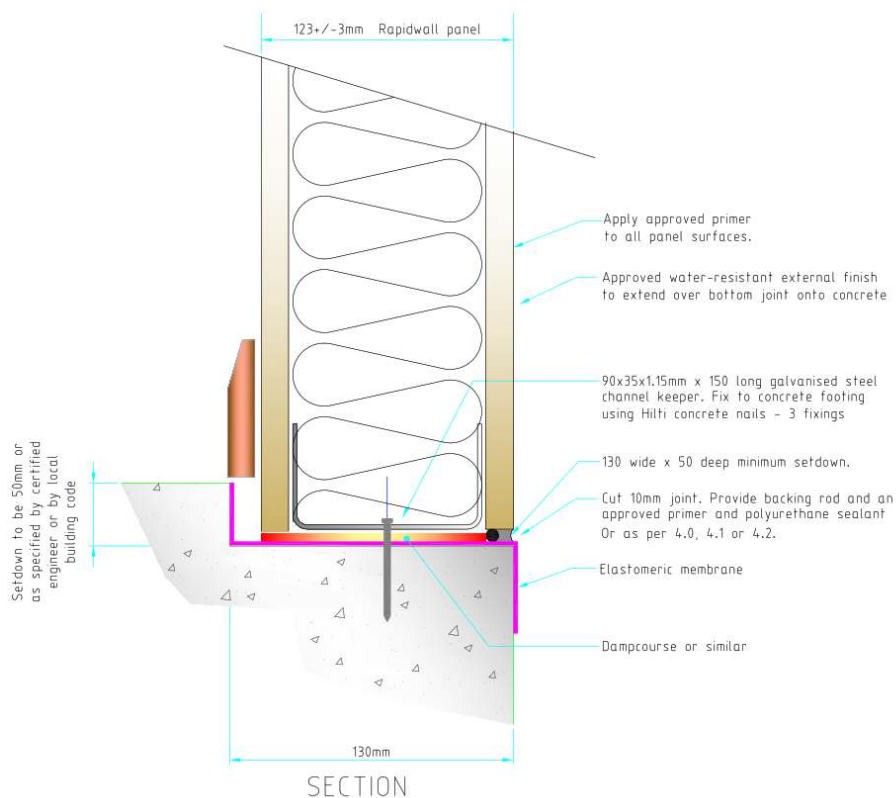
Typical Slab Edge detail insulated Rapidwall
